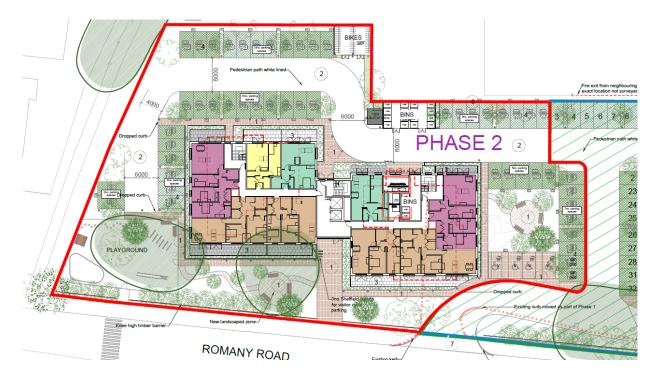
Proposed Layout (Shared access with Columbia House to north / right hand side of plan)
